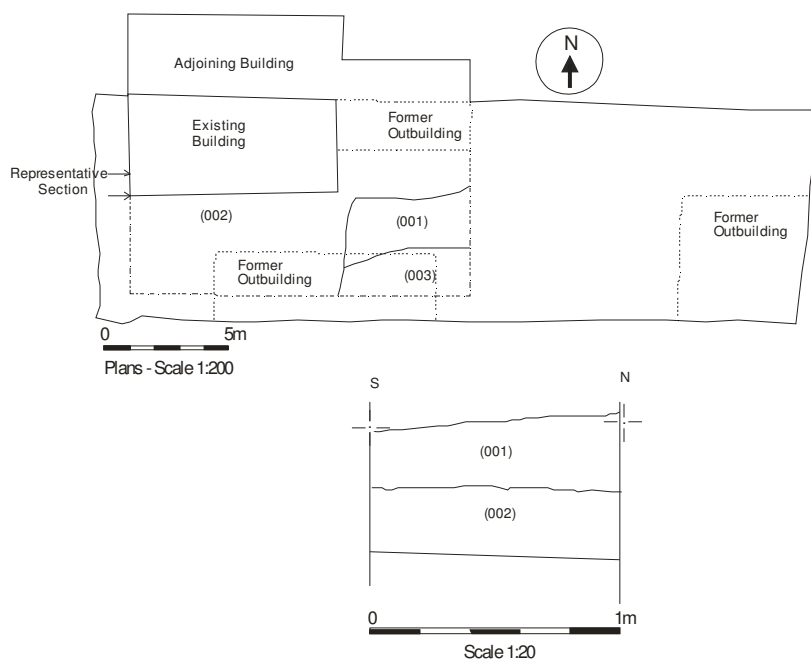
Scale plan of excavated area (1:200) and representative section of excavated area (1:20).
